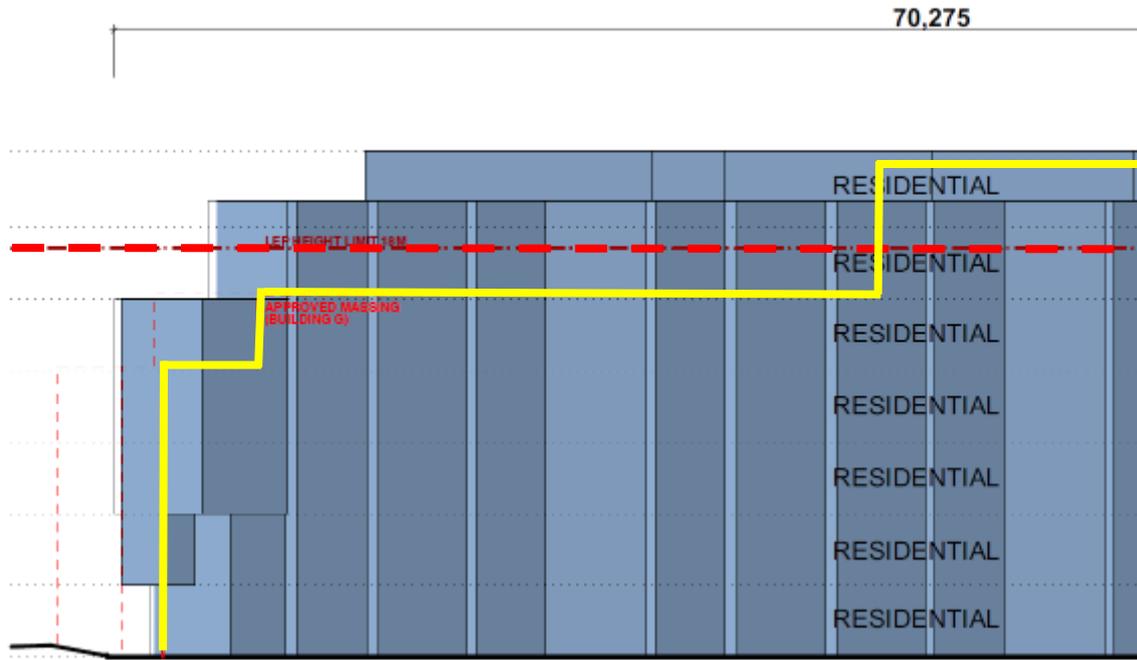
South elevation of building G (Parkside buildings). The yellow line shows the approved concept envelope and the red dashed line shows the 18 metre height limit.
